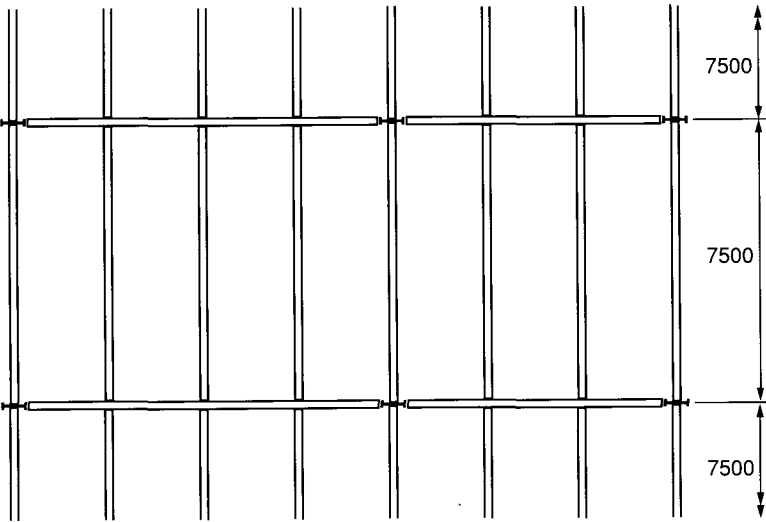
Part-plan showing layout of floor beams (dimensions in mm)
